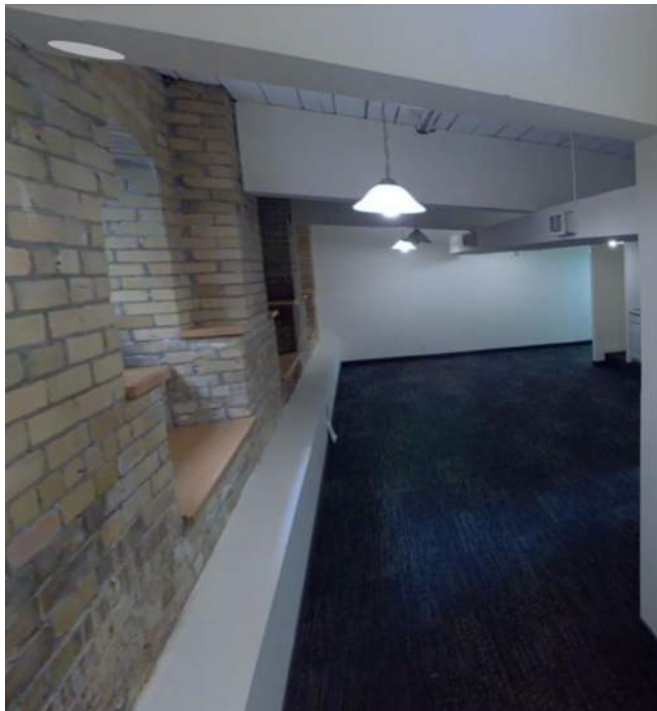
B EXISTING BASEMENT OPEN SPACE
